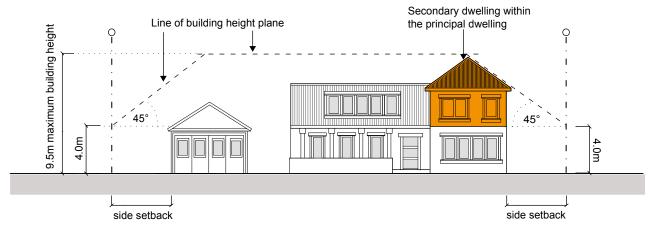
C.3-1: Building height plane- secondary dwelling within the principal dwelling.
